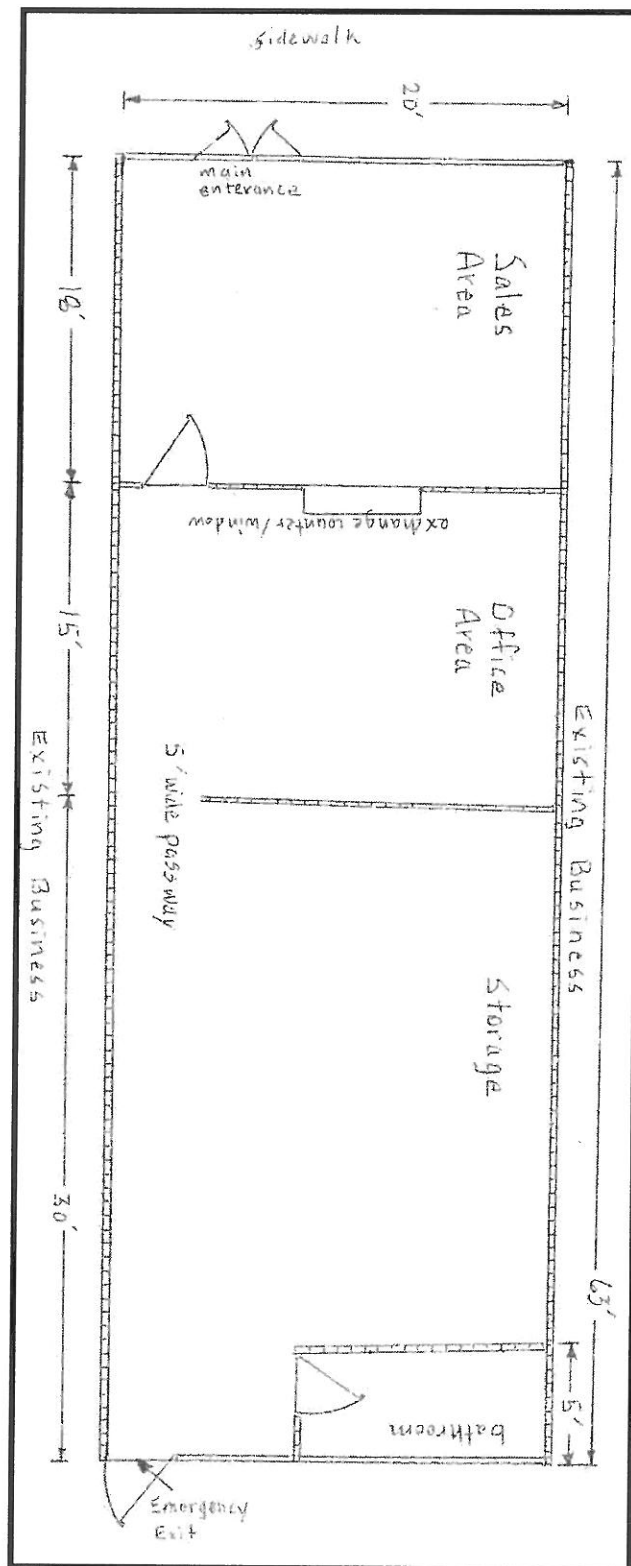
Exhibit D: Proposed Floor Plan (Tenant Space AB)
